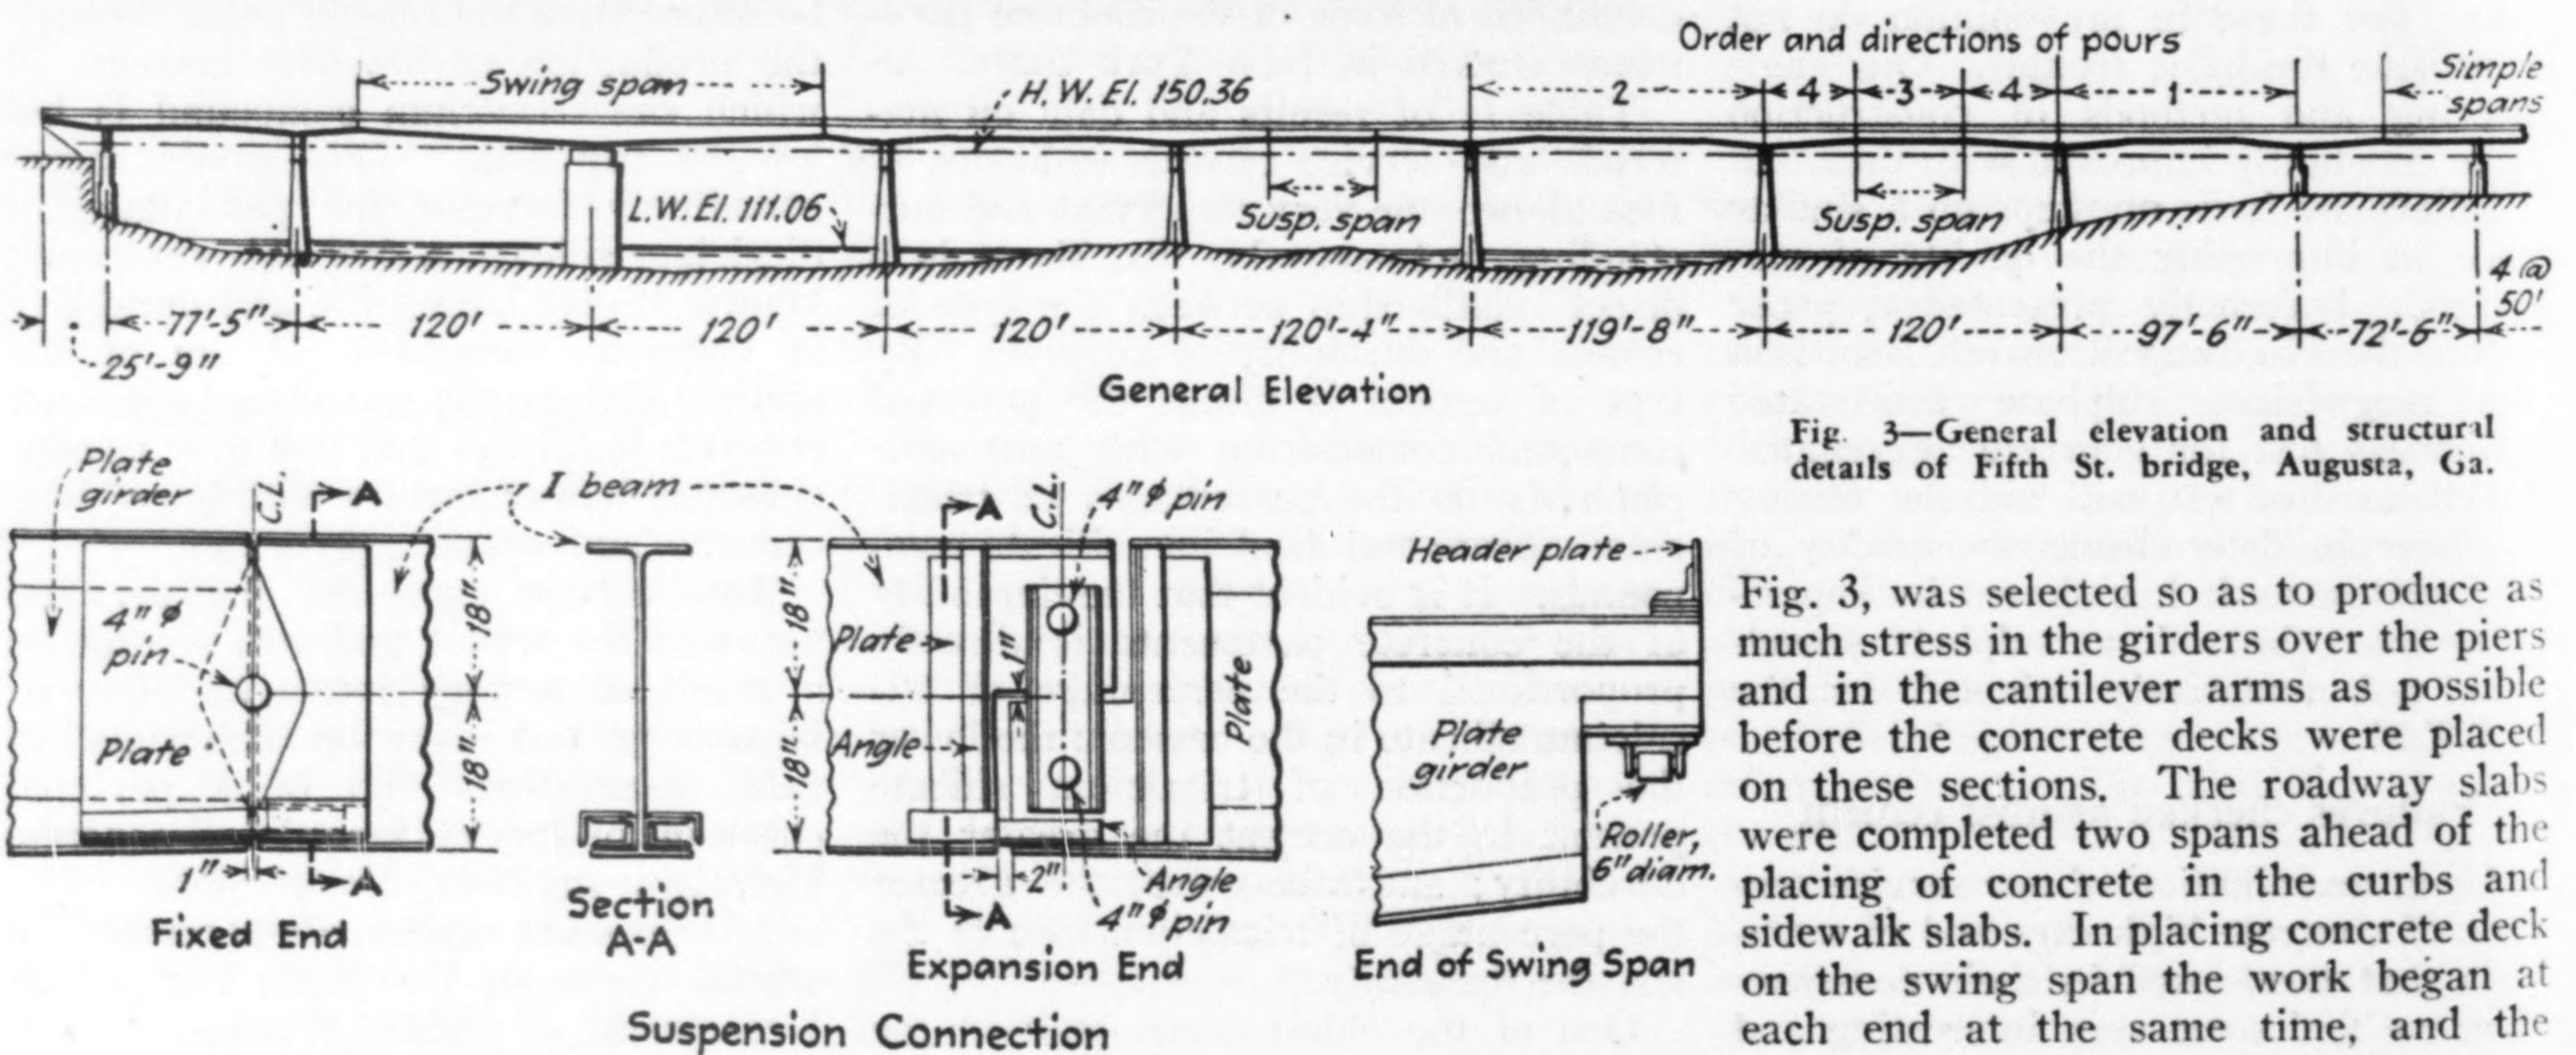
General elevation and structural details of Fifth St. bridge, Augusta, Ga.
